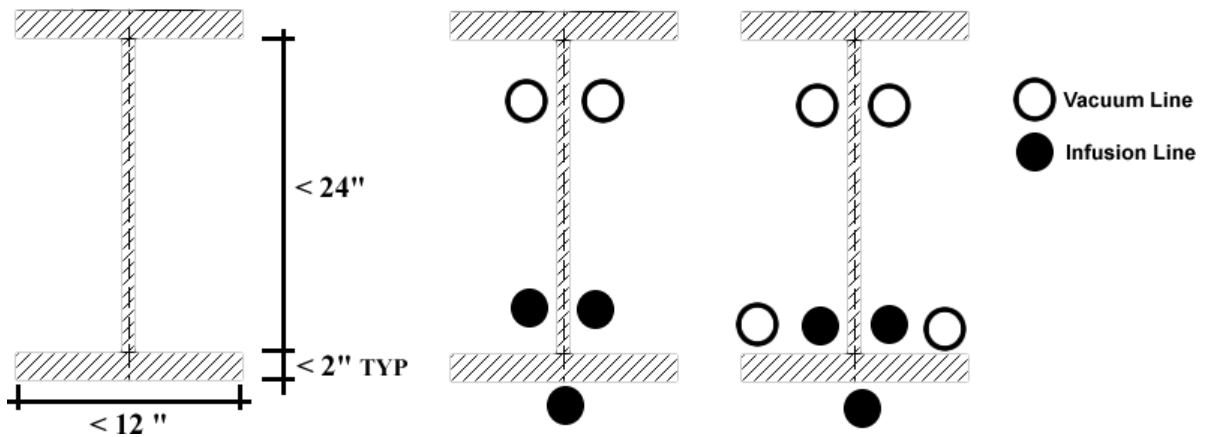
Proposed placement of infusion and vacuum lines – Steel girder section.
